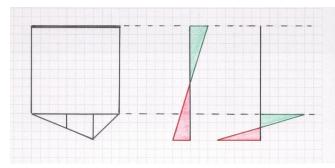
left: sketch of the walkway section with the triangular box girder, the glass walls and the roof plate; middle: bending stesses/strains for the complete section; right: bending stresses/strains if the box girder solely reacts to bending – this is what we wanted to achieve.
